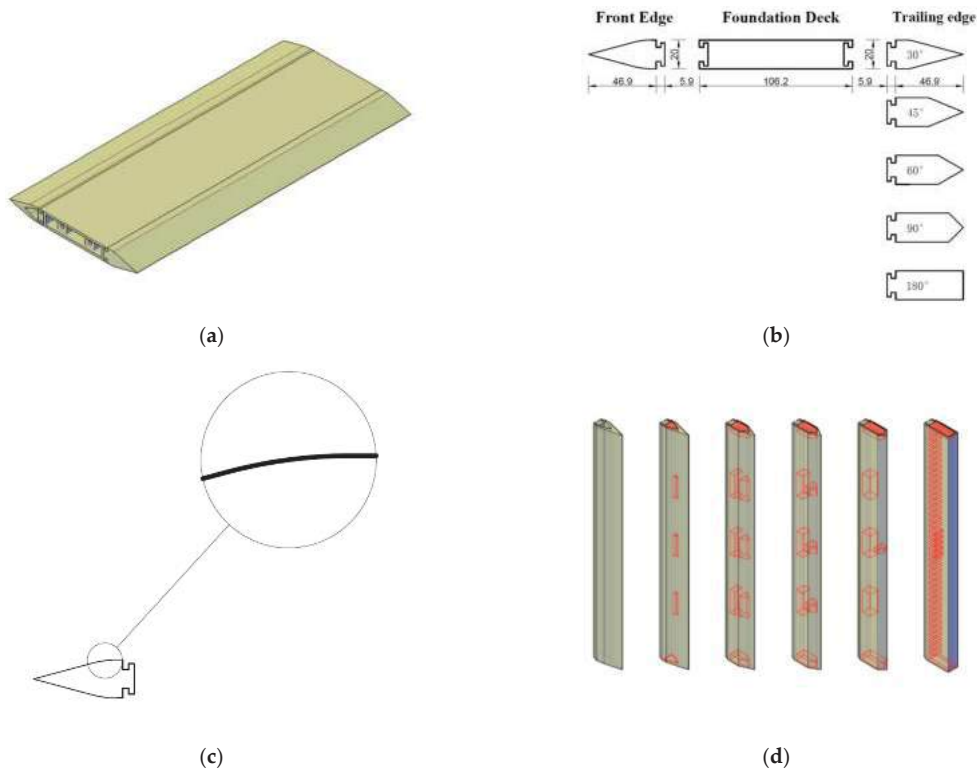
Details of the test model. (a) Overview test model (case 30c-30). (b) Cross section. (c) Details about FE. (d) Details about the masses added inside TE.
